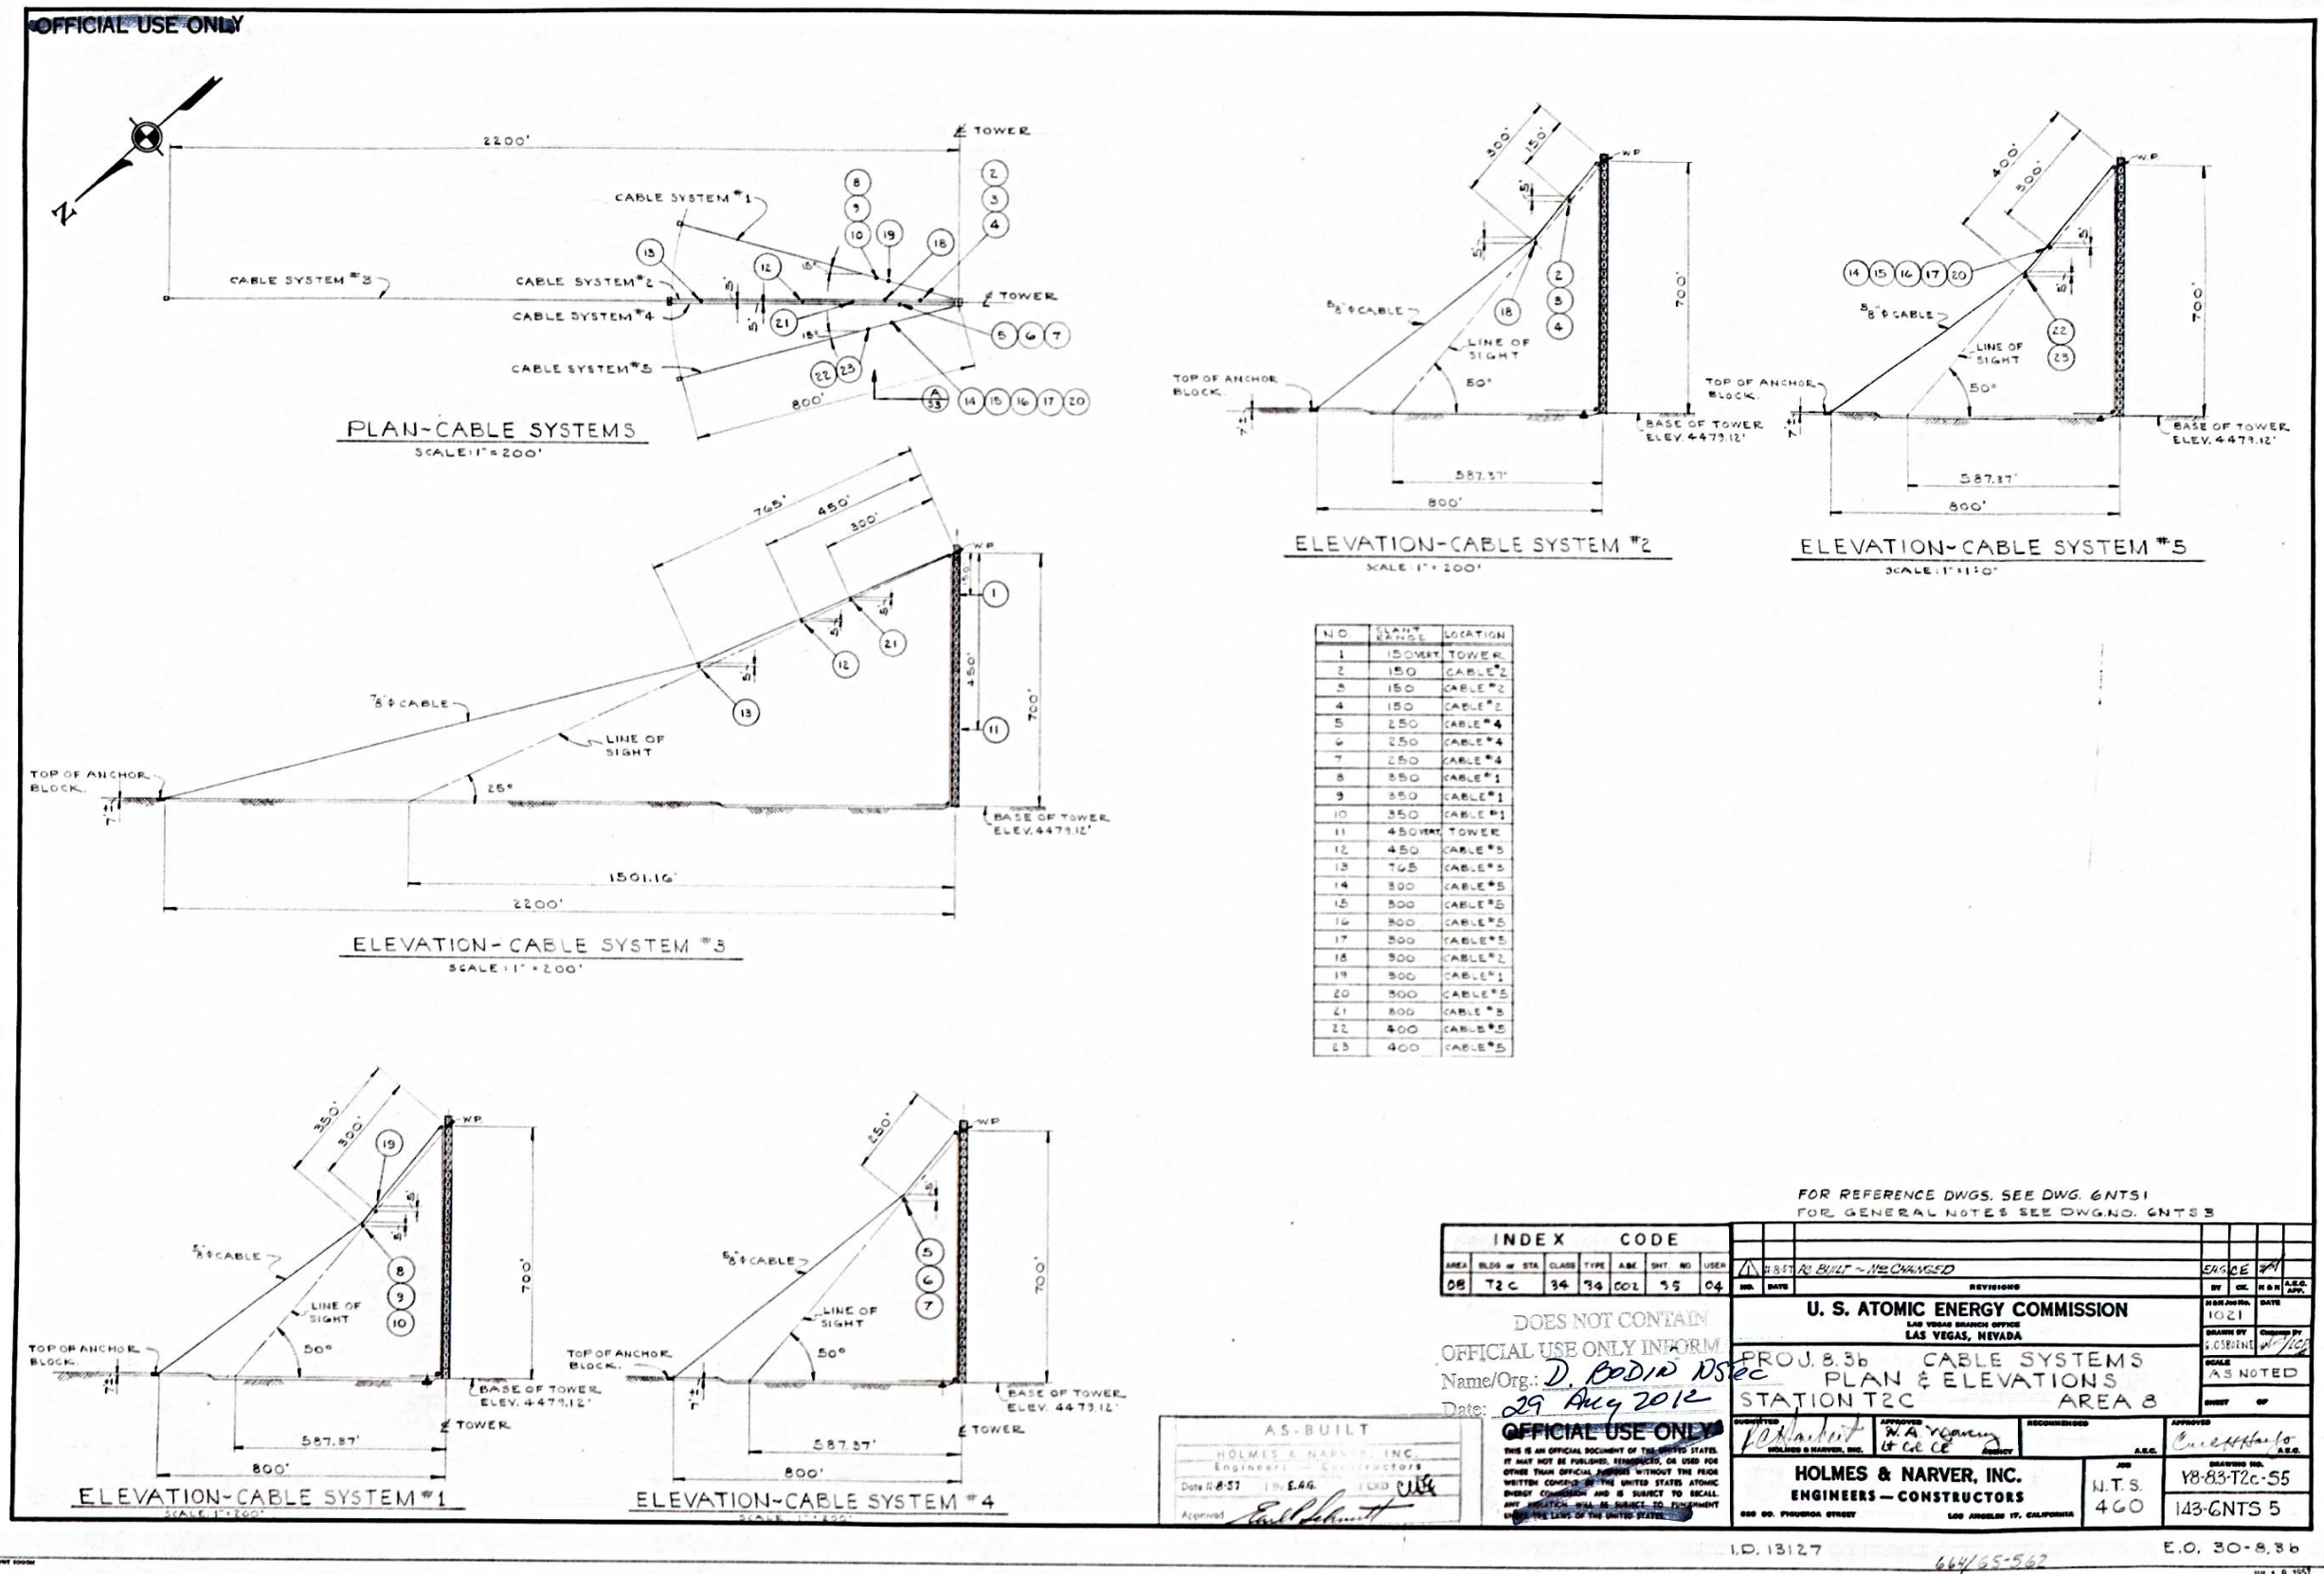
Layout of experiments for instrumentation cable system, plan and elevations.
